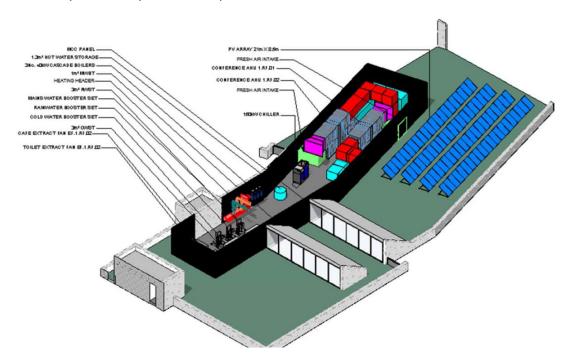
Proposed Cultural Centre Roof Level Plant Compound
